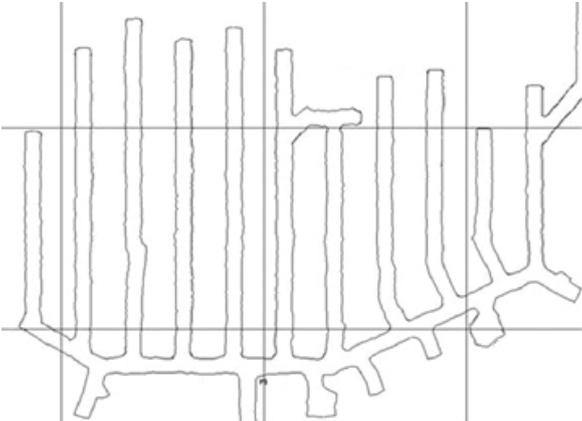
A typical layout of the Kiirunavaara mine (Courtesy LKAB)
